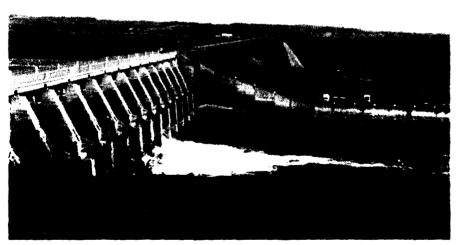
Spillway and embankment, looking north. May 1979.
